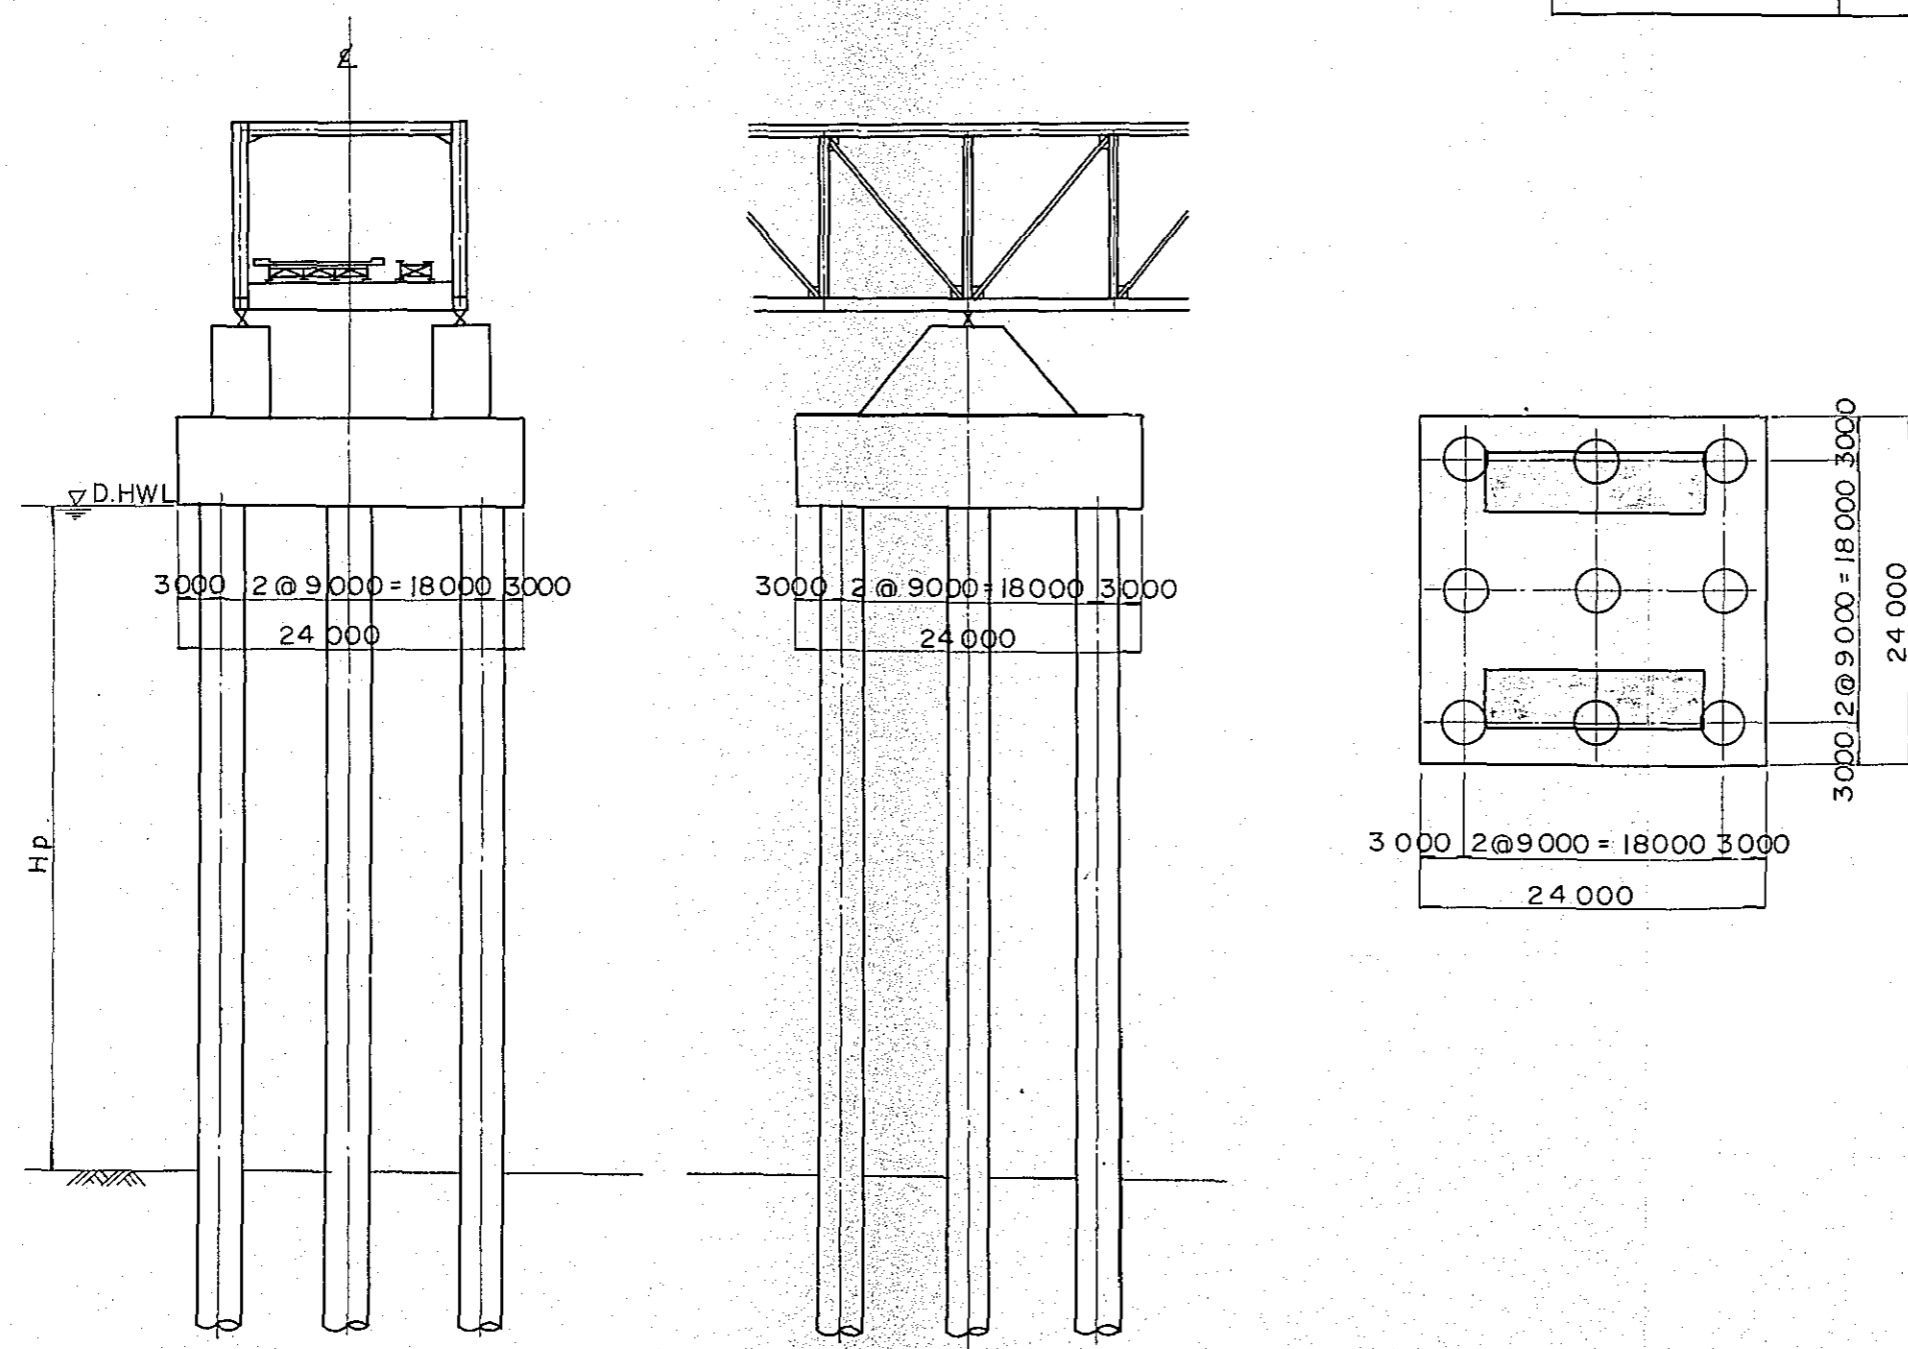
Outline of structure of multi-pile foundation ϕ 30m
